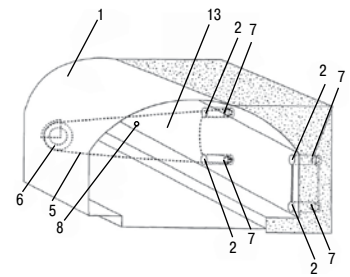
Tunnel of the design profile, four boreholes cut at the perpendicular plane, and the strip cut in the perpendicular plane, and the rotation tool
